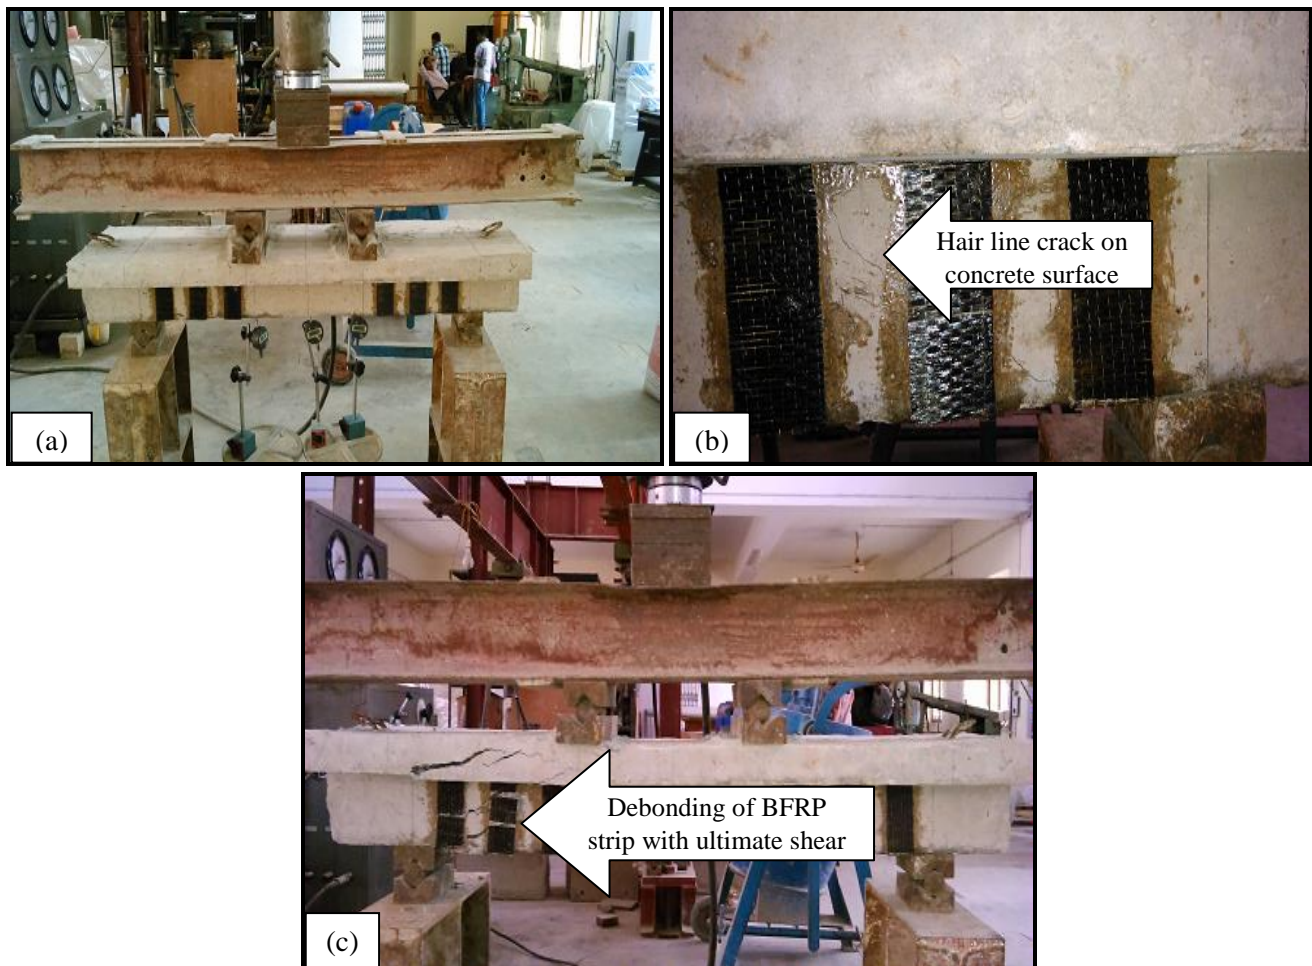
(a) Experimental Setup of beam SB4 under four-point loading system, (b) Hair line crack started in shear region at a load of 65kN, (c) Ultimate failure of beam SB4 by debonding of BFRP strip followed by diagonal shear crack
